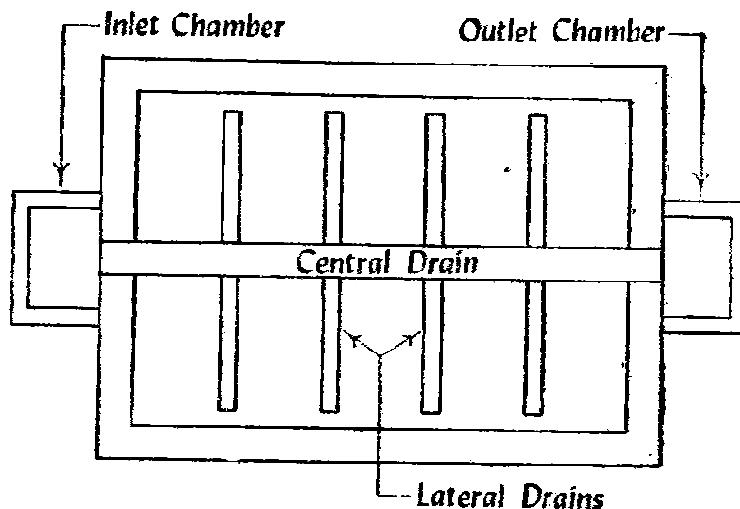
(a) – Plan of a typical rapid sand filter (gravity type)
